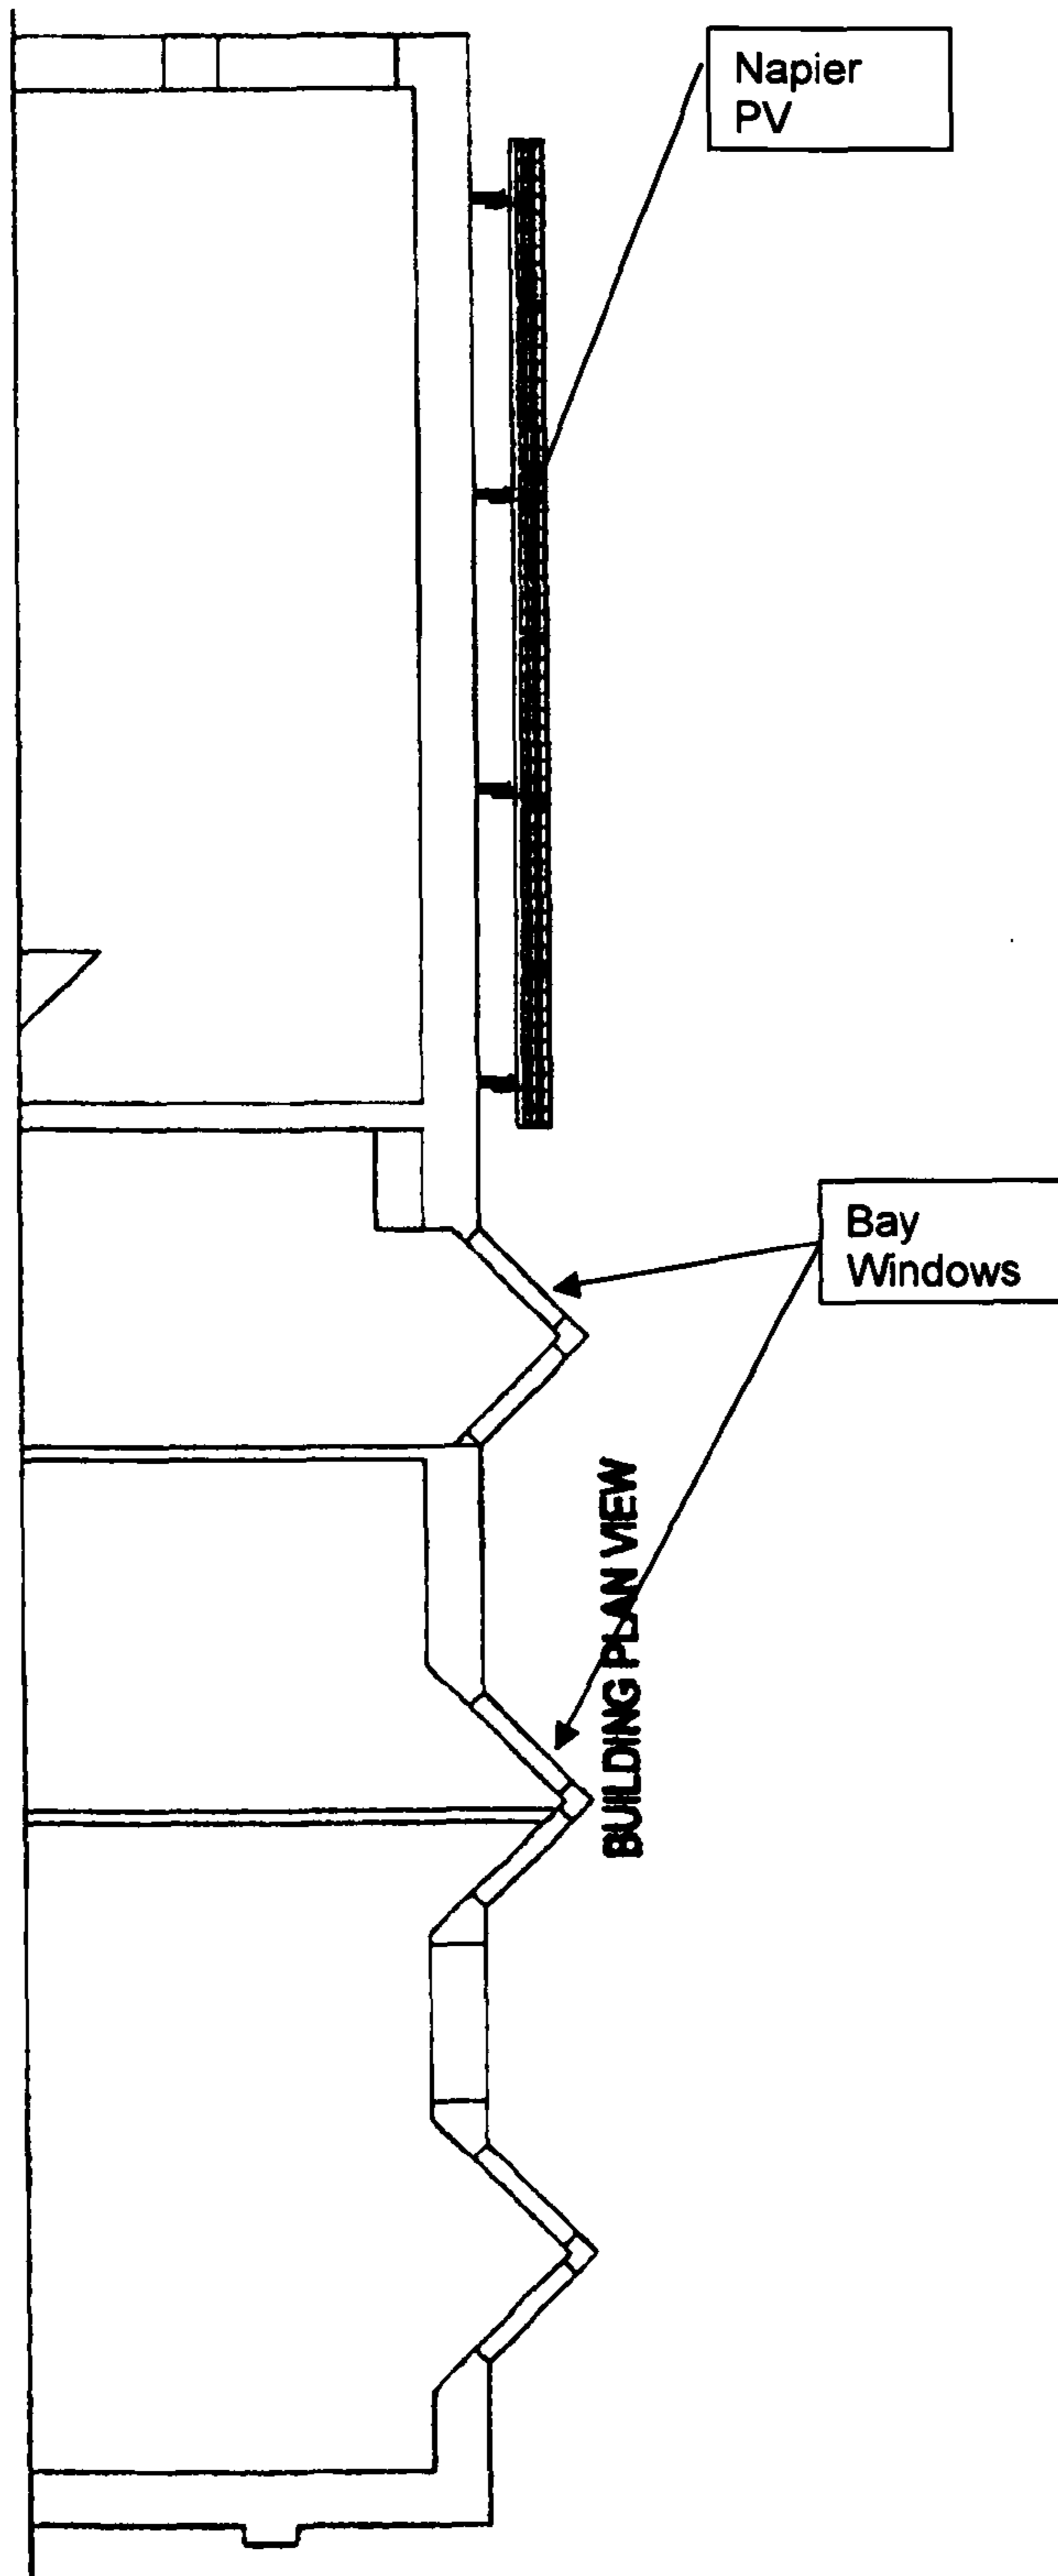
Plan view of Napier PV facade, showing PV array and bay windows.
